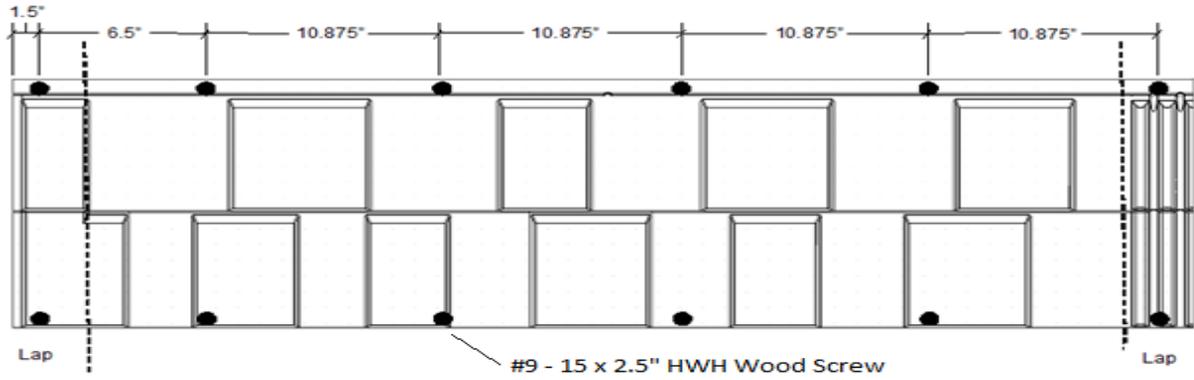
Terrabella Shingle® Panels Fastened To Wood Deck
